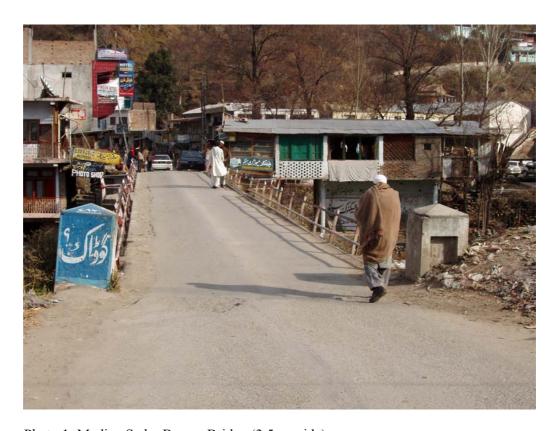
Madian Sadar Bazaar Bridge (3.5 m wide)
